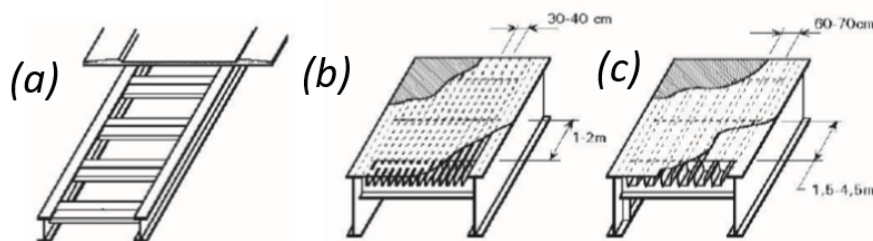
(a) main beams with girders (b) concrete slab configuration (c) composite deck configuration (Romeijn, 2006a)
